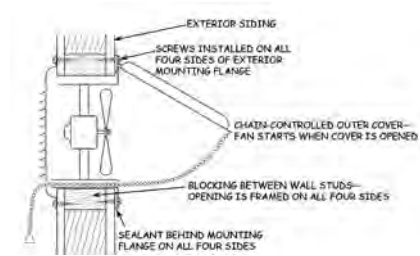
WALL-MOUNT KITCHEN EXHAUST FAN
